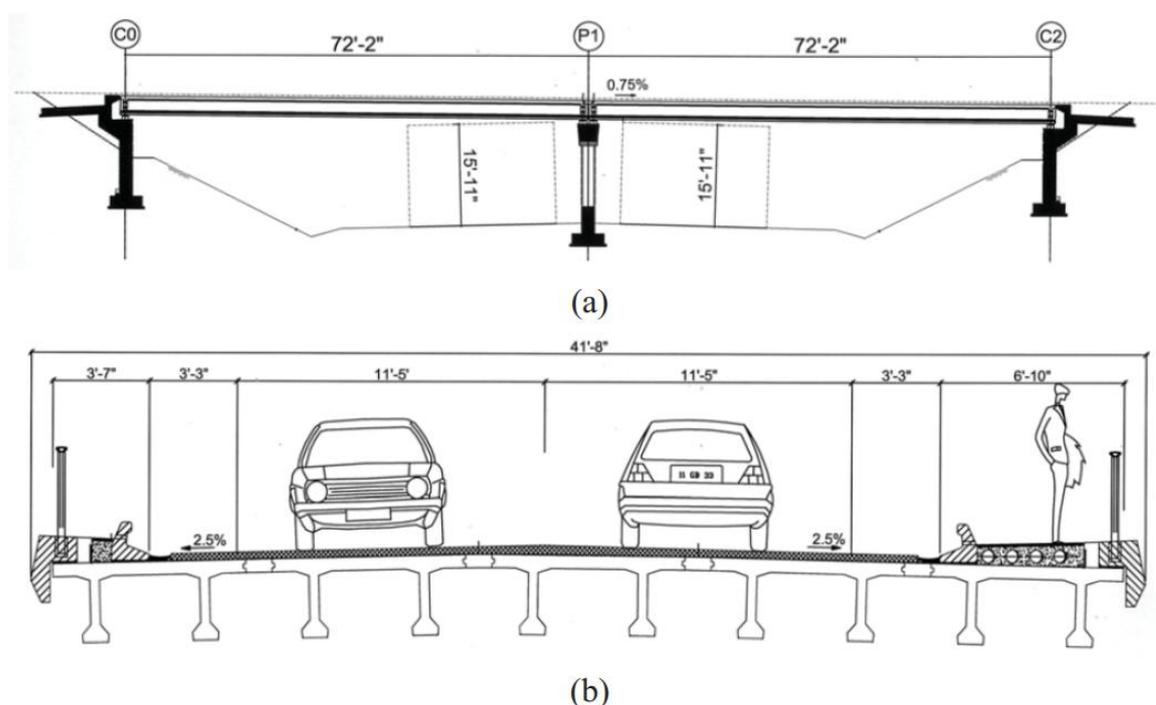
Roury-Les-Valence bridge (a) Longitudinal cross section (b) typical cross section
